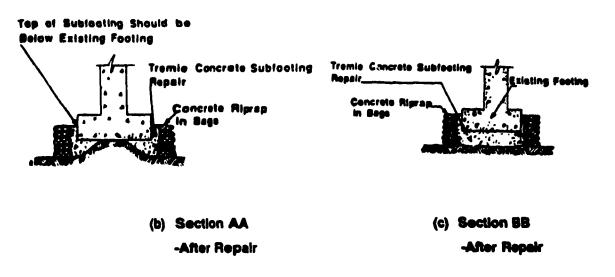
CONCRETE RIPRAP AND TREMIE CONCRETE SUBFOOTING28
